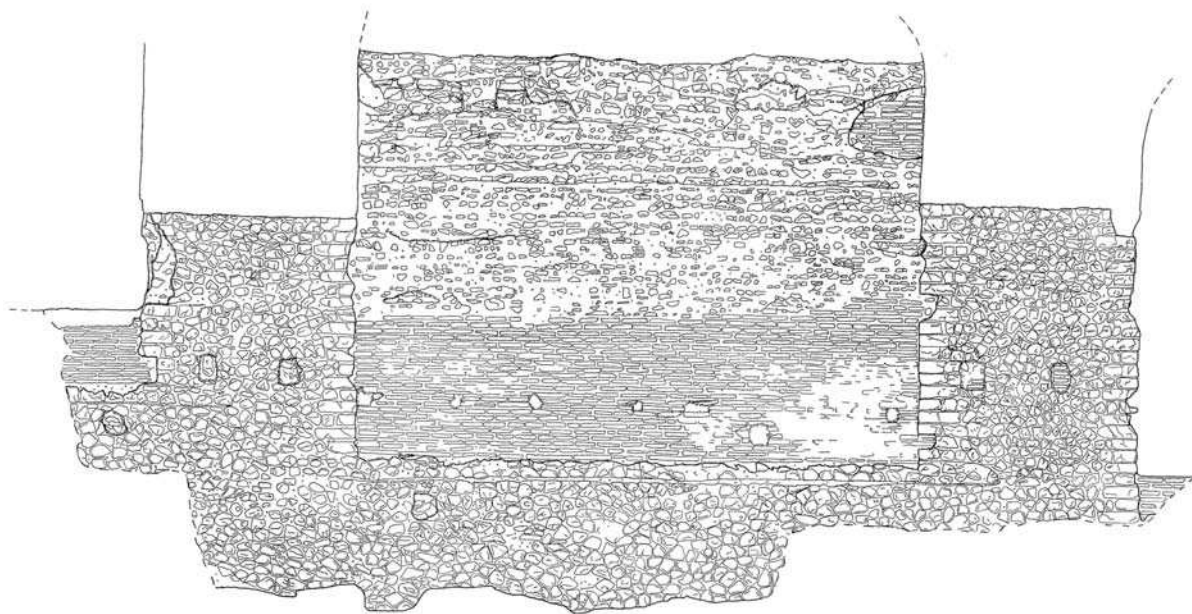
Drawing of the pillars B15 and C15 and the continuous wall in opus incertum which could be interpreted as foundation. On top of the latter one finds the Imperial wall in opus testaceum which impedes the passage between aisles XV and XVI through corridor B, seen from the northeast (drawing by A. Tartaro).
